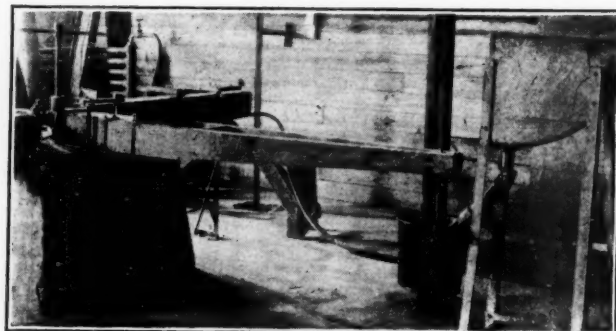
VIEW OF TESTING APPARATUS USED IN DETERMINING TRANSVERSE BREAKING STRENGTH OF CONCRETE BEAMS
